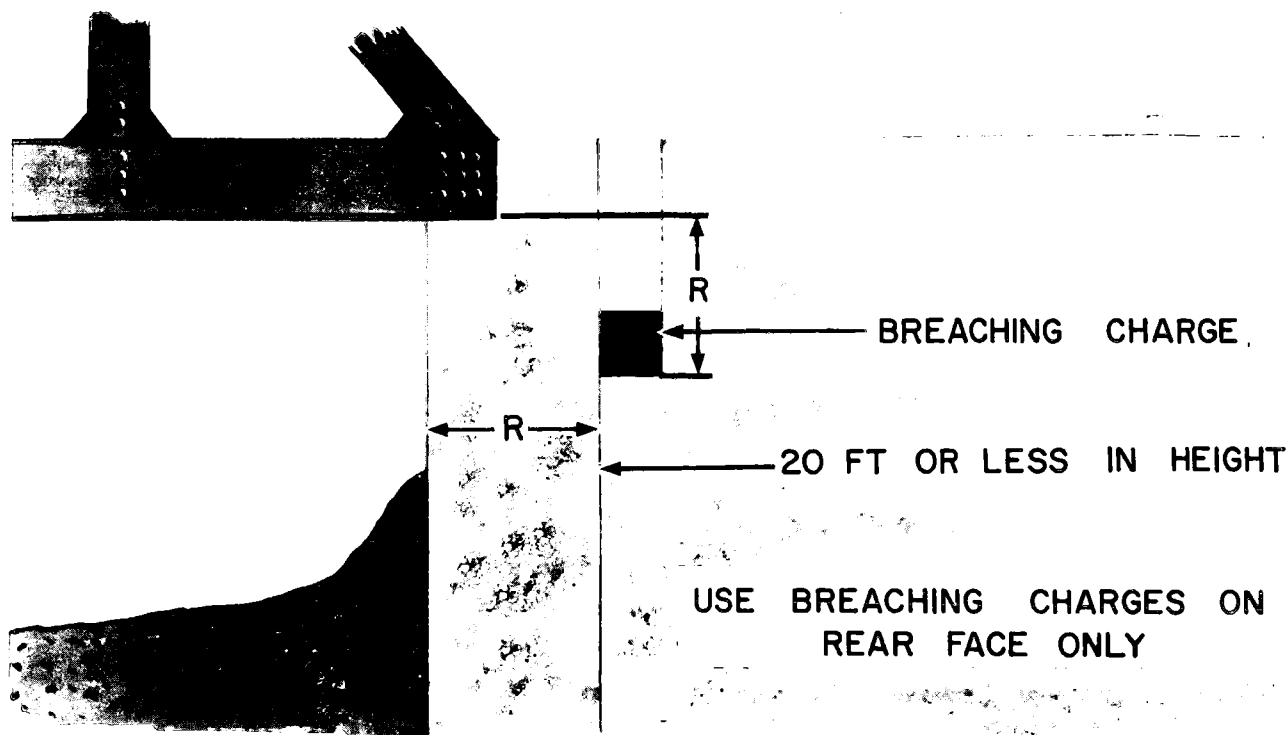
Charges placed in fill behind reinforced concrete abutment more than 5 feet thick.
